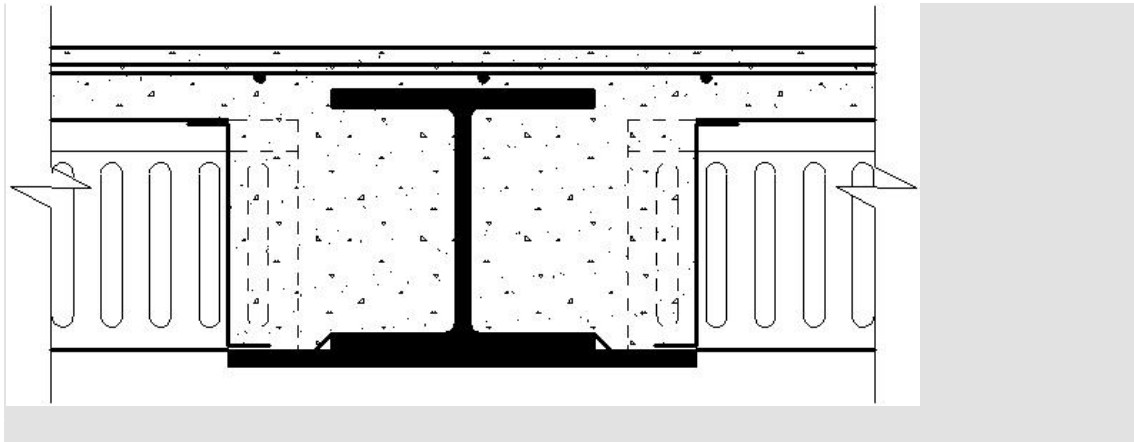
Typical Slimfloor beam slab supporting a composite slab with deep decking
